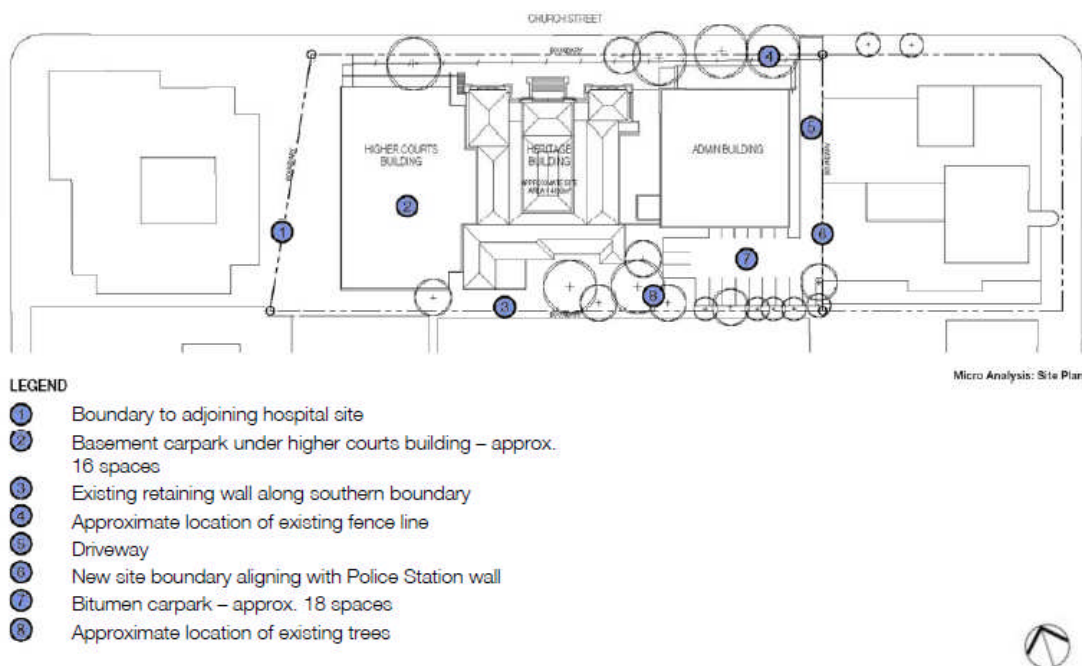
Site plan of the Newcastle Courthouse complex and adjacent Police Station. (Suters Architects 2012)
